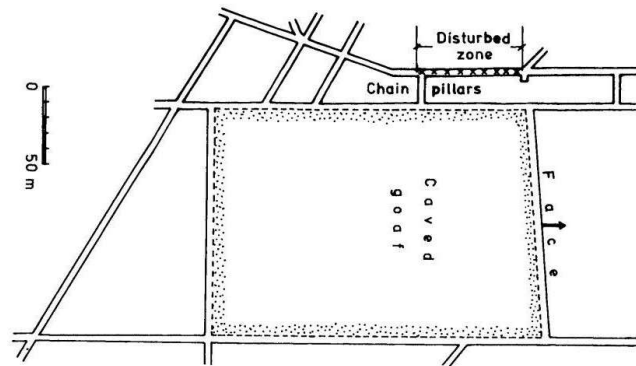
Plan showing disturbed zone in the roadway of a longwall panel in Moonidih
